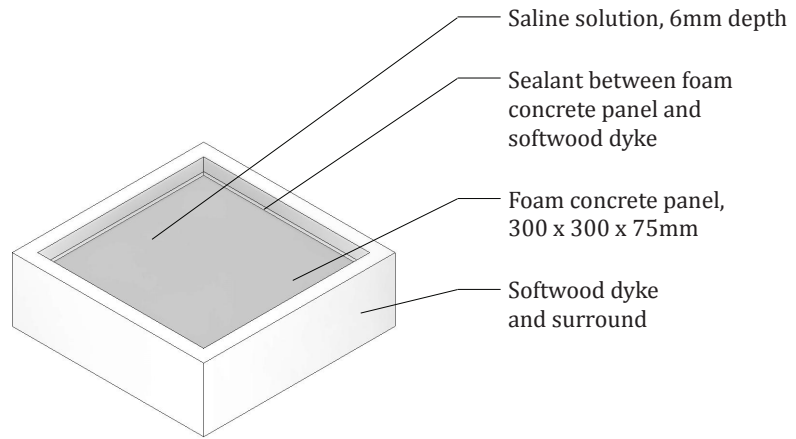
Isometric drawing of foam concrete panel with softwood dyke and surround.
